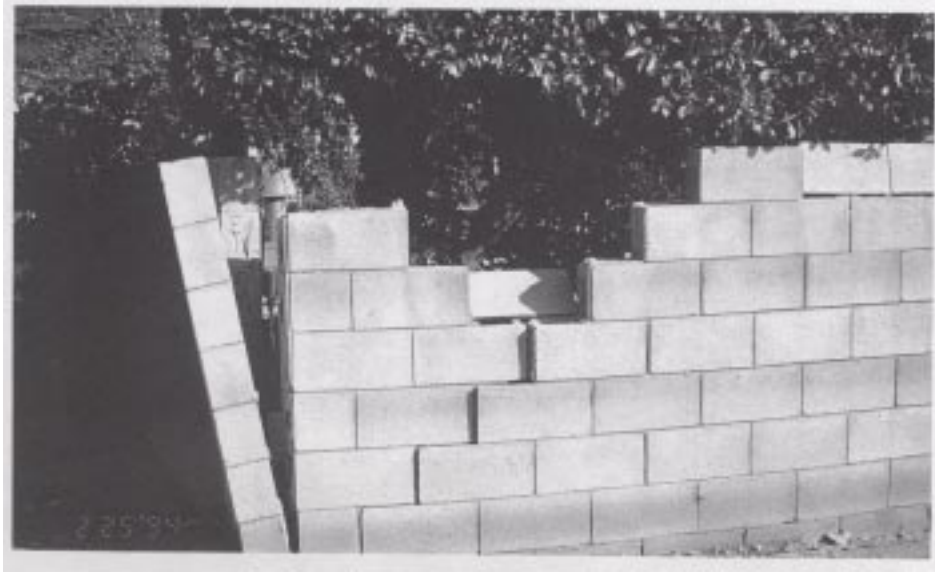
An example of common damage to masonry privacy walls or fences.
